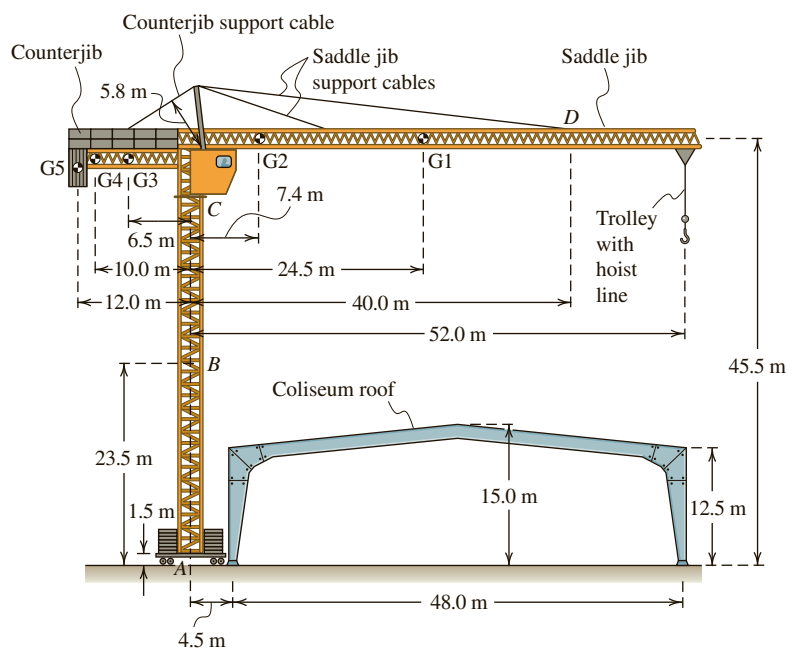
Tower crane Option B on rails along the side of the building.
